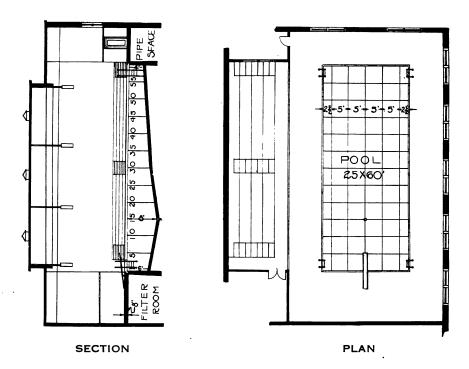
Various Natatorium Details. Spring Board anchors should be set when the concrete floor is poured. Note direction lines on the bottom and on end walls, and the distance markings on the side walls of the Pool.
